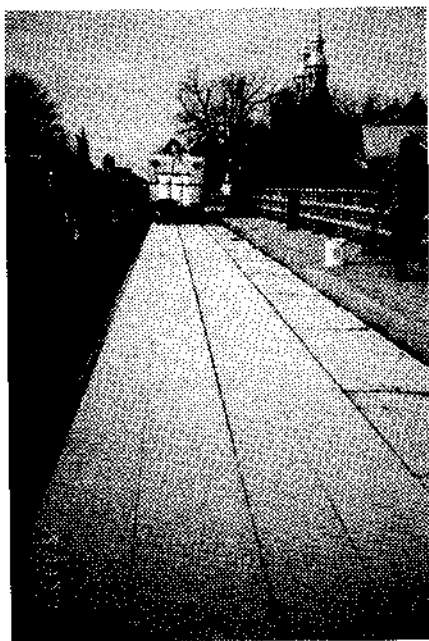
The machine unrolls, welds and presses down on the membrane in a single pass
